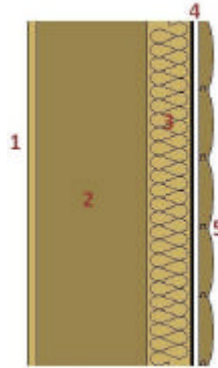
Cross section of the ventilated façade with 1) 12.5 mm gypsum board, 2) 24 cm thick autoclaved aerated concrete blocks, 3) 10 cm mineral wool with wind barrier, 4) 12 mm ventilated air channel and 5) 20 mm softwood boards fitted tongue and groove
